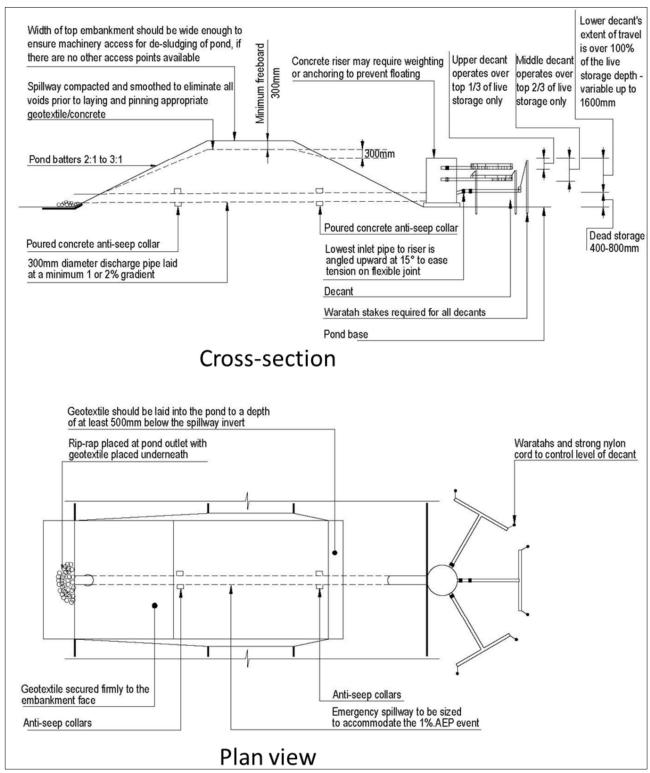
Cross-section and plan view for a sediment retention pond with a contributing catchment area between 3 and 5ha.
